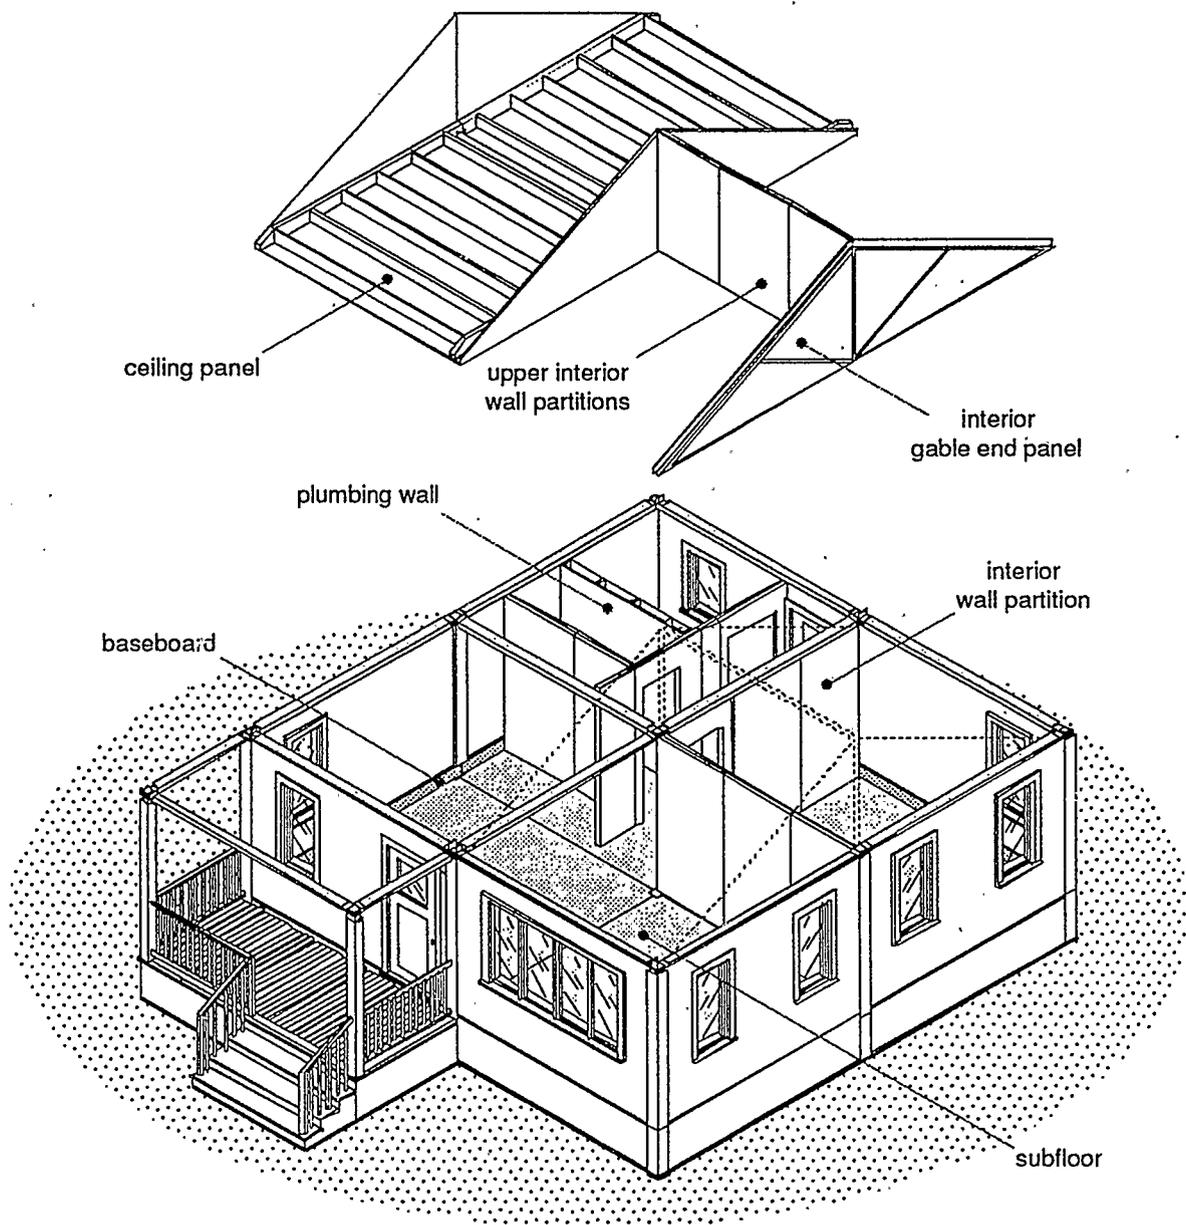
Installation of plumbing wall, peripheral trim, and interior partitions
